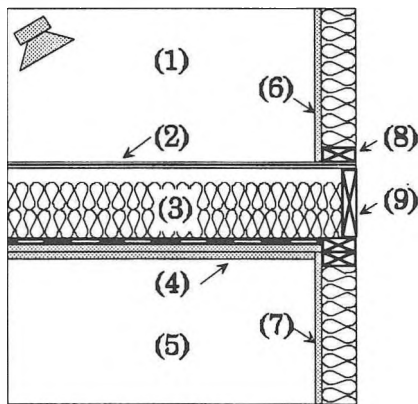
Sketch the floor/ceiling assembly and the load bearing party walls that are modelled. The sub-systems are (1): source room, (2): 15.9 mm OSB decking, (3): 235 mm deep cavity with two layers of 89 mm batt insulation, (4): 2 layers 12.7 mm type X gypsum board mounted on resilient channels, (5): receive room, (6) and (7): 15.9 mm type X gypsum board.
